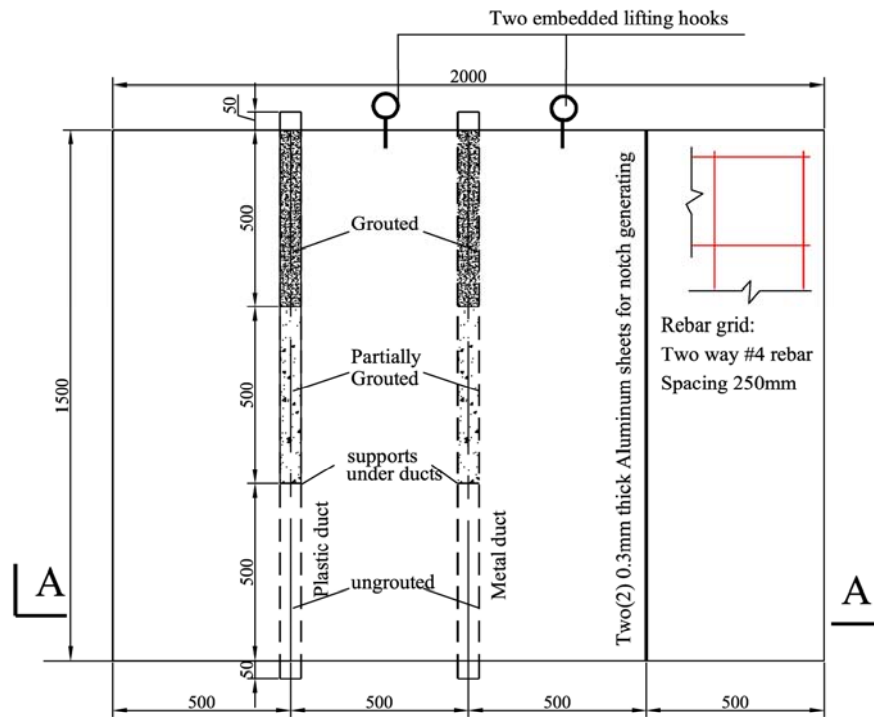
Drawing of reinforced concrete test slab that contains internal defects. All dimensions in mm. Hybrid tests carried out along a line which runs over the internal ducts.
